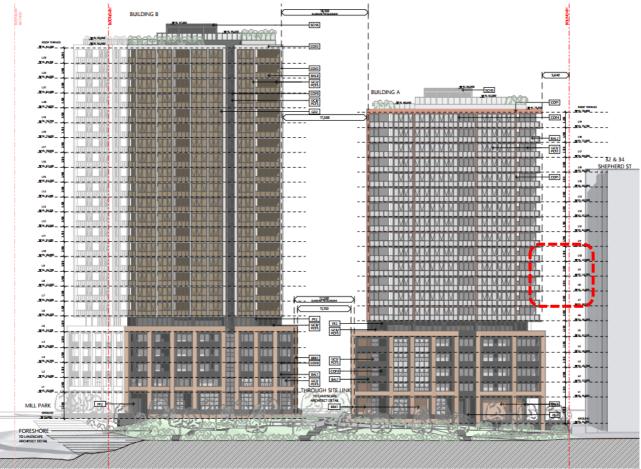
Proposed building separation with 32 Shepherd Street – Levels 7-10
